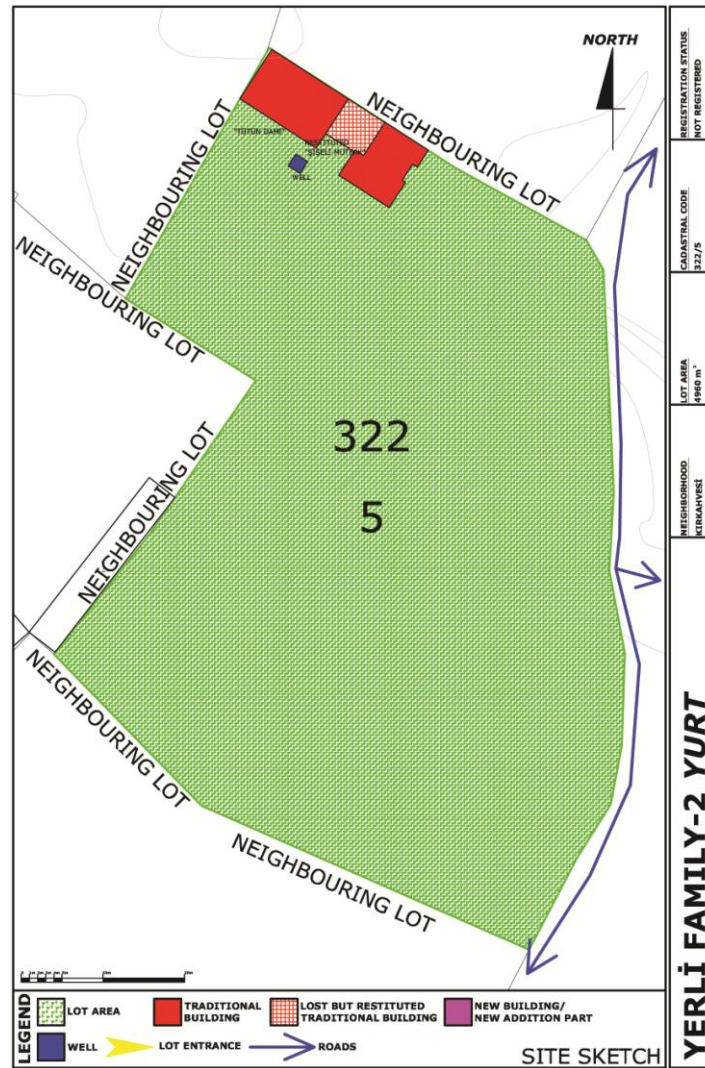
Site plan sketch of the yurt of Yerli Family-2
